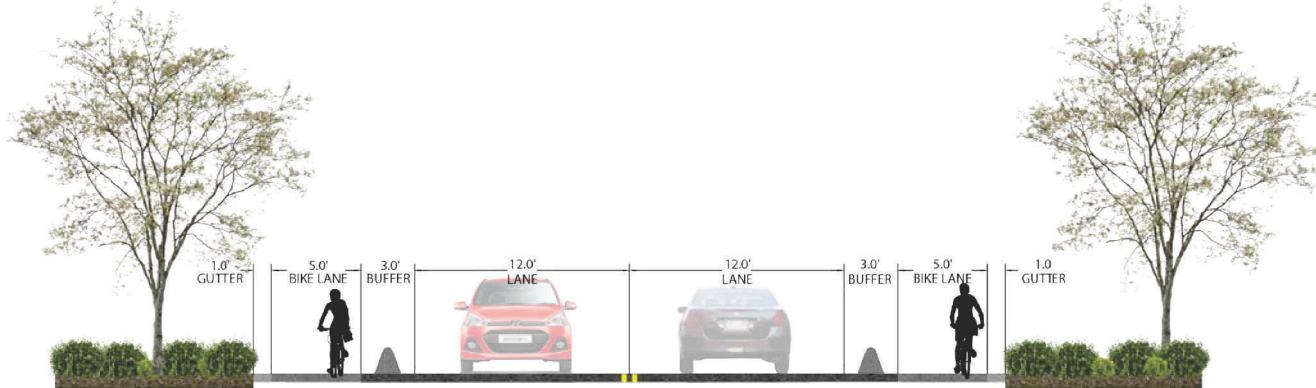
East Jordan Canal Trail typical sections of protected bike lanes on Creek Rd from Aspire Surgical to Siesta Dr.
